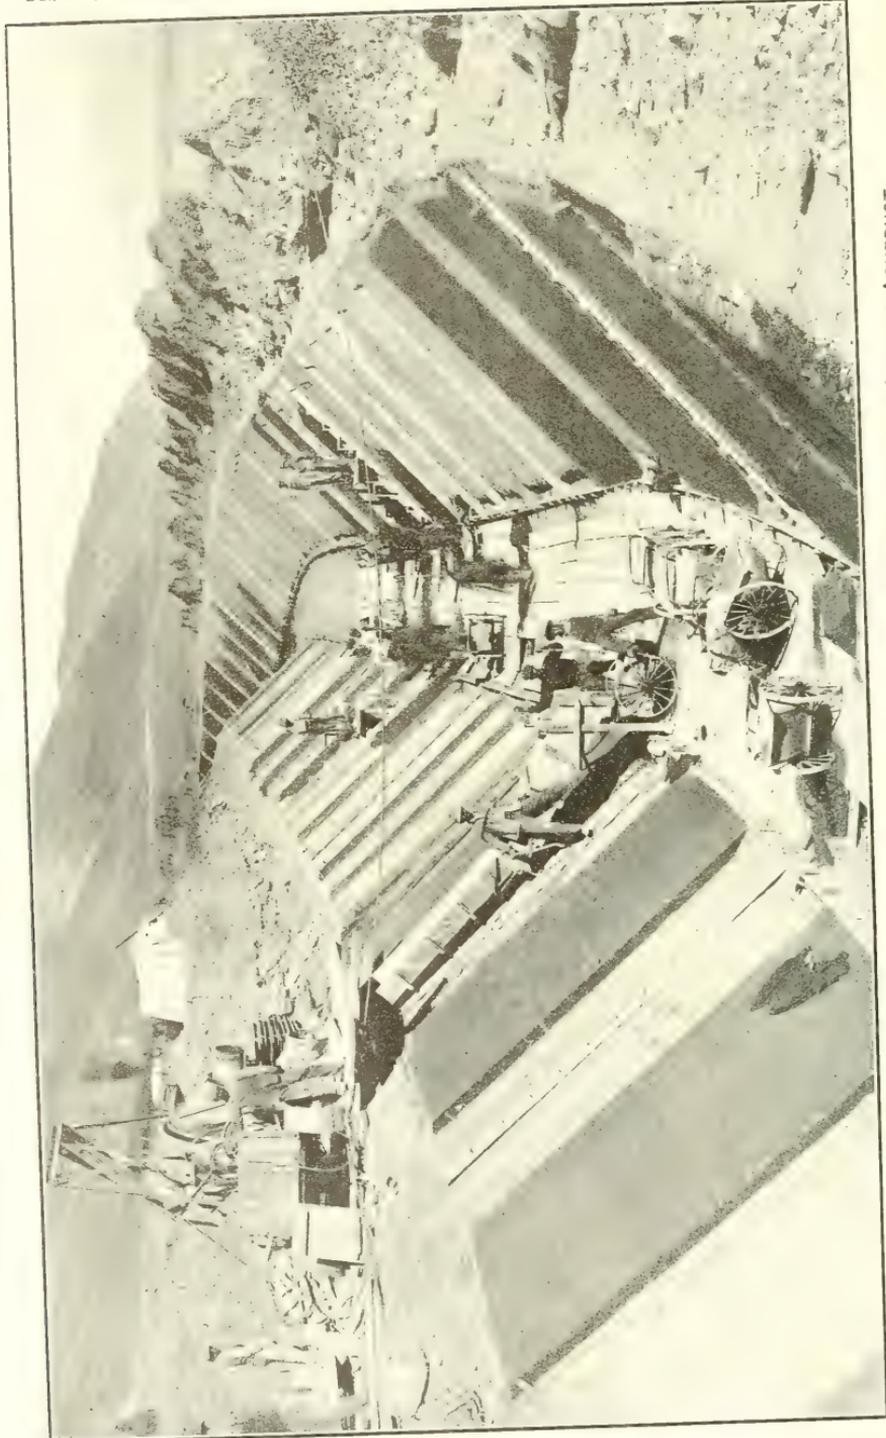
METHODS USED IN CONSTRUCTION OF CONCRETE LINING, DAVIS AND WEBER COUNTIES CANAL, OGDEN, UTAH.
